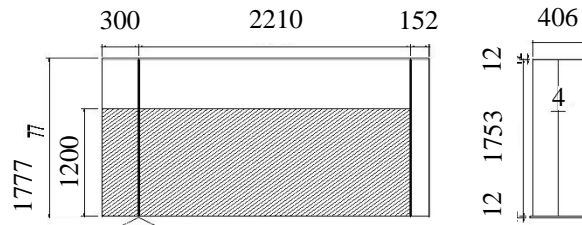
Dimension and Shape-bonding of the CFRP sheet [22]
